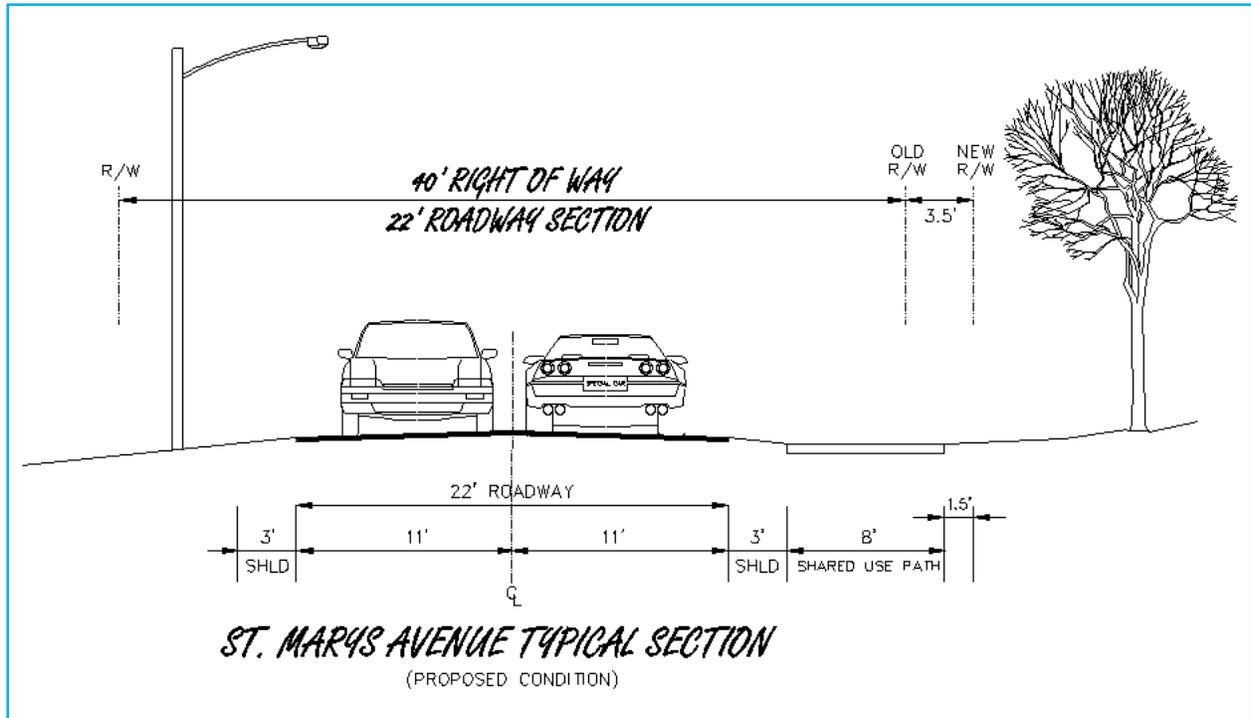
ST MARYS AVE. TYPICAL SECTION – 40’ R/W – 22’ PAVEMENT WIDTH – 8’ SHARED USE PATH
